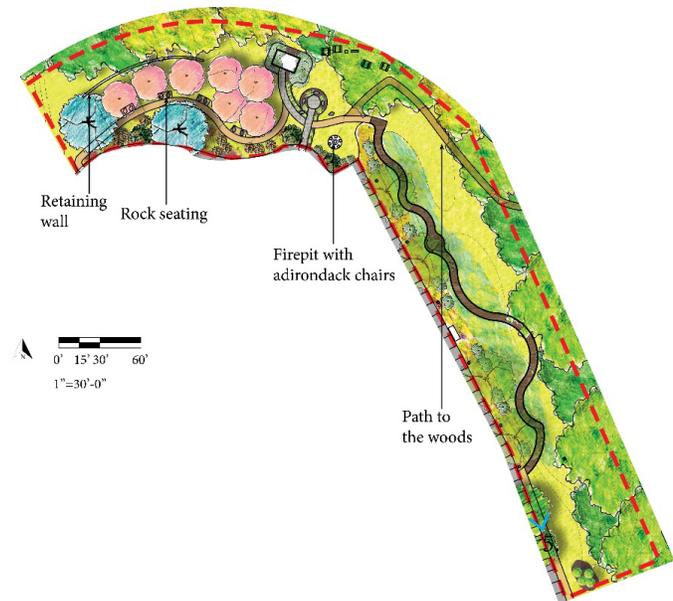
Site plan of the Jacob Wheeler Bird Memorial Garden
